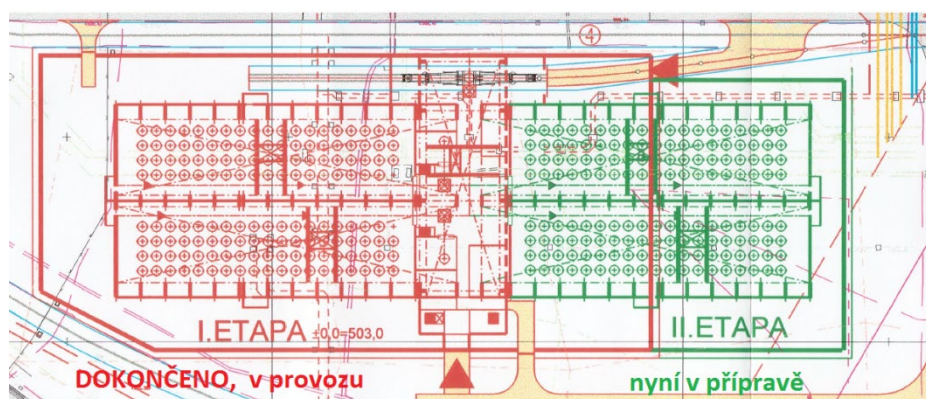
The existing SNF storage (red) and planned new SNF storage capacity (green)
